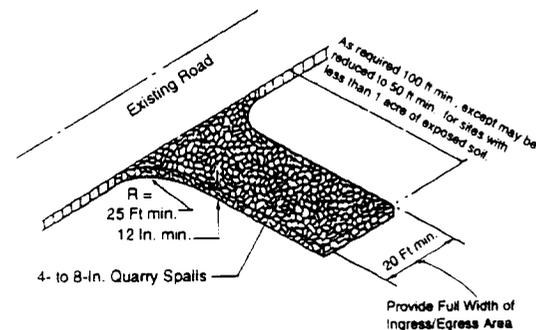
Stabilized construction entrance (from Washington Department of Ecology, 1992).
